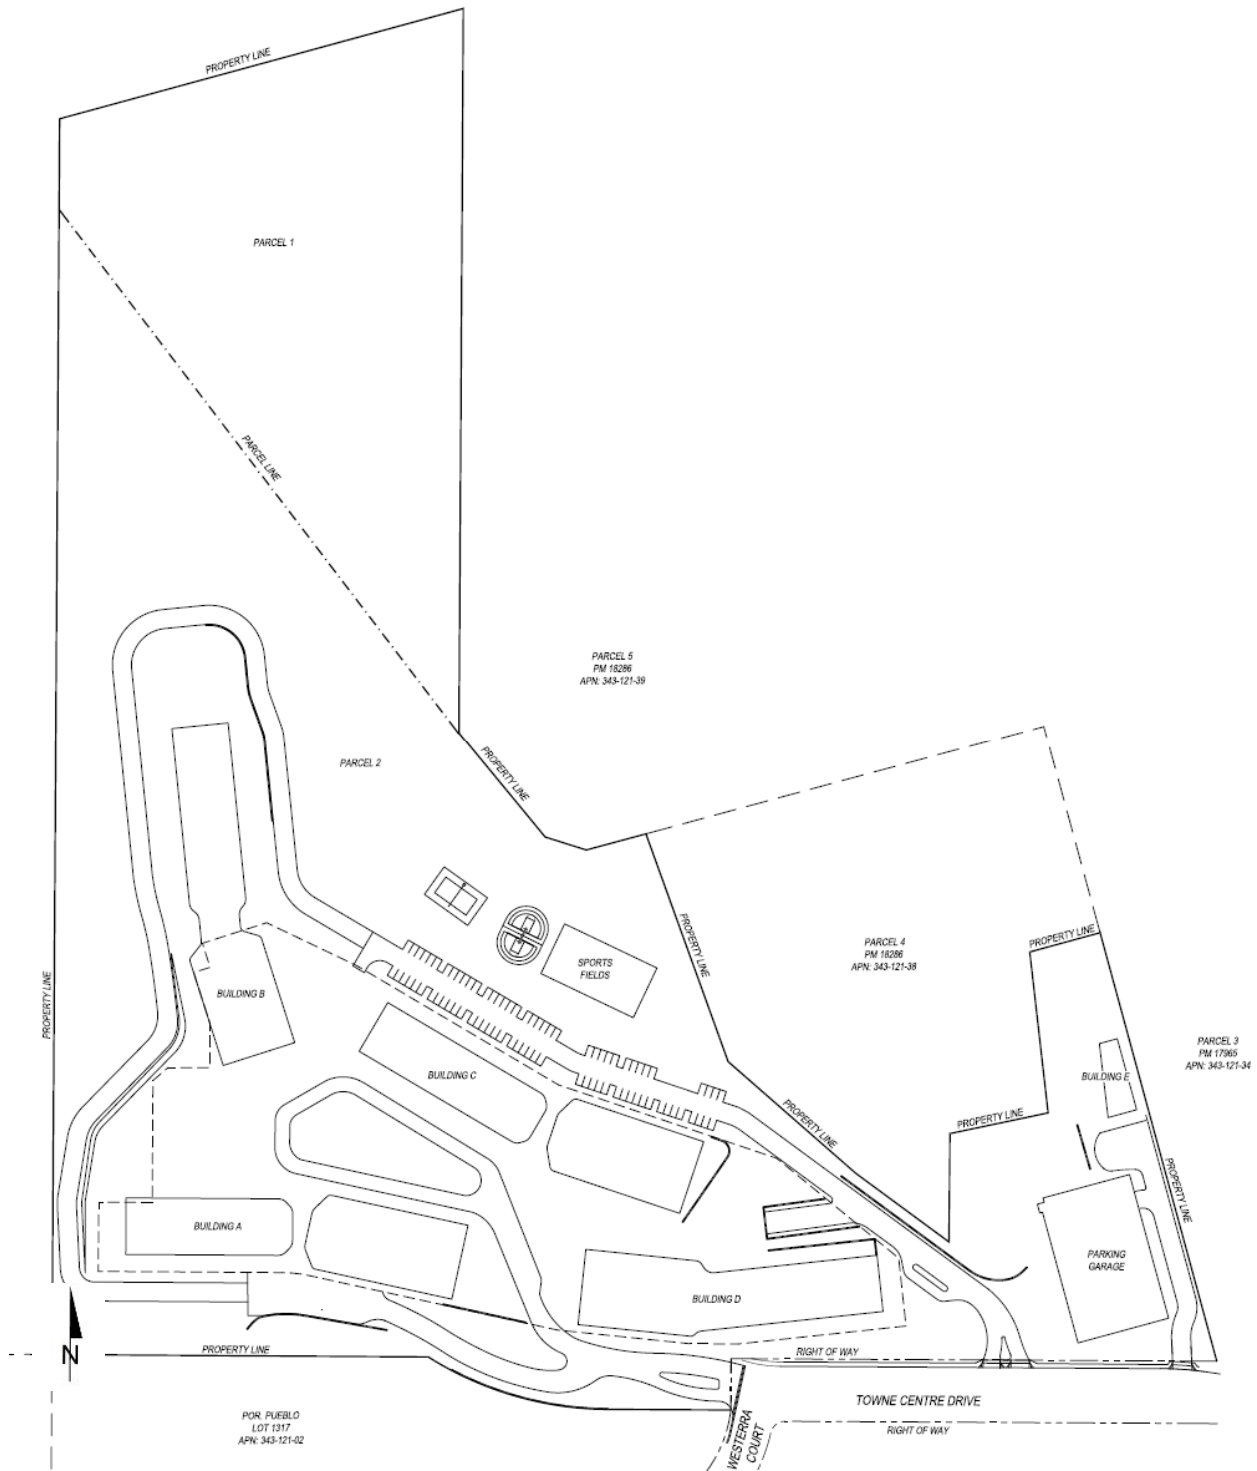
B: CONCEPTUAL SITE PLAN
